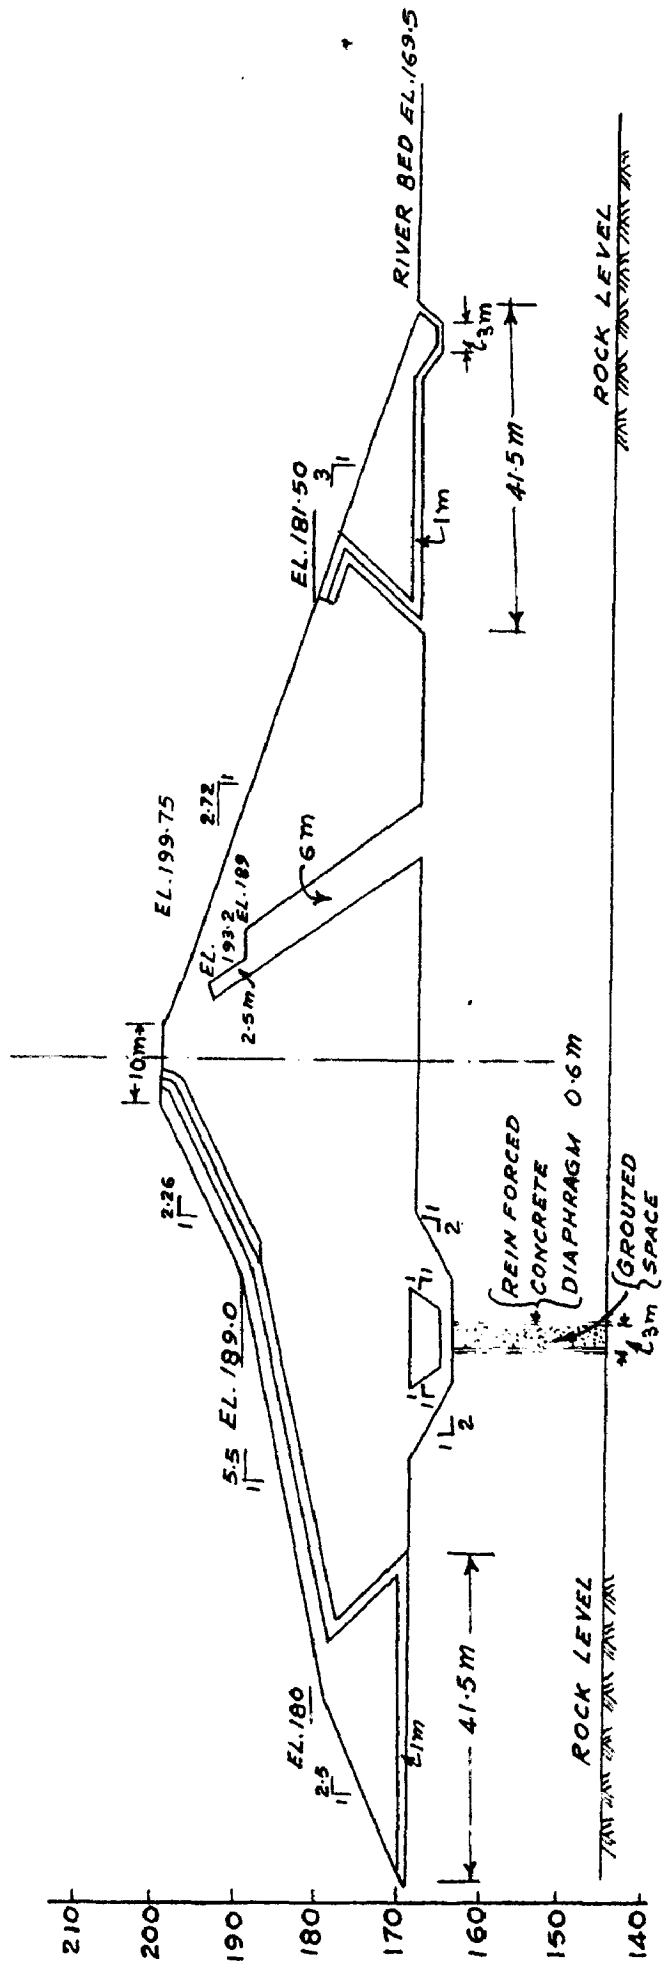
SHOWING THE EARTH DAM SECTION
